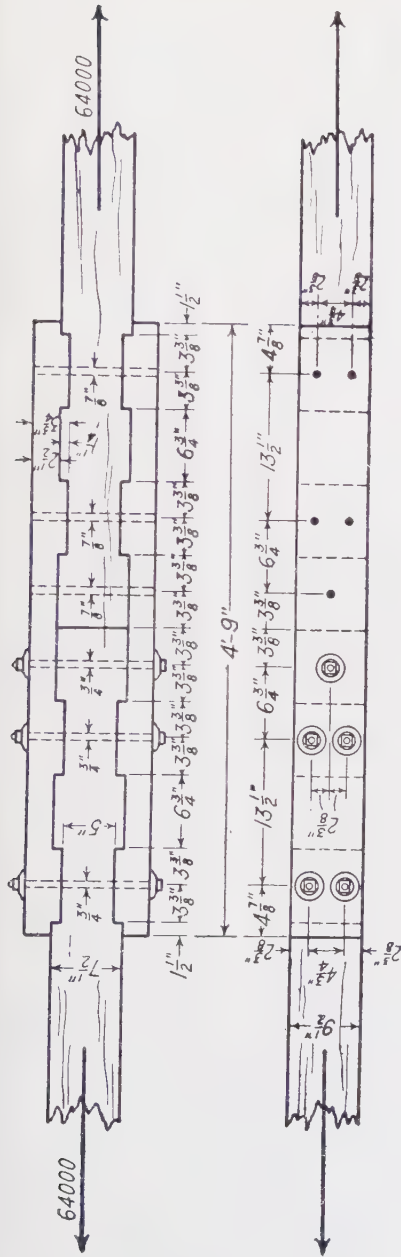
Working Drawing of Tabled Fish-plate Joint.
